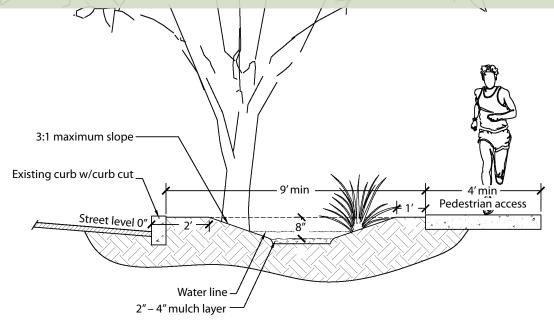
Section B. Typical cross-section of a basin with sloping sides, showing typical setbacks for a site on a residential street with on-street parking. For plan view, see Appendix.
